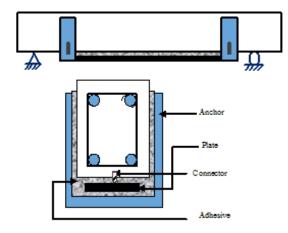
Alam: Proposed U-shaped hybrid anchor system with connector.
